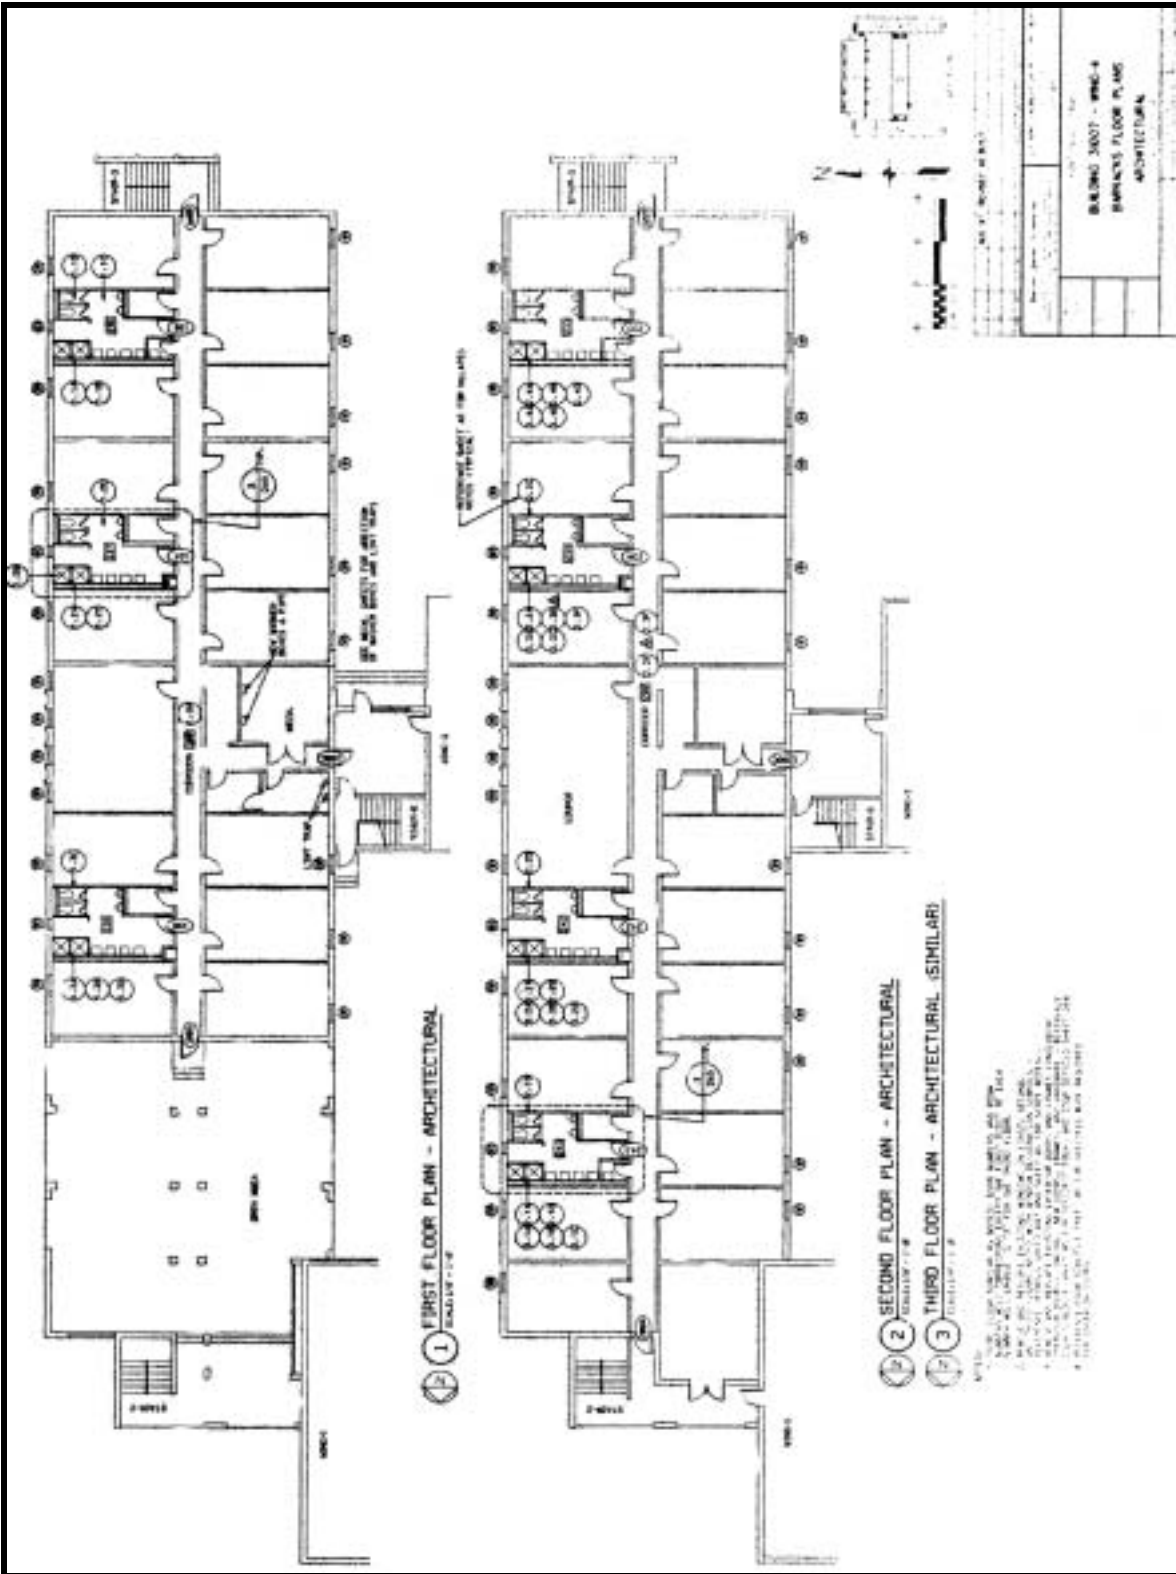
A-style barracks, Bldg. 31007 floor plans, wing 4 (ca. 1971, revised 1997) (Engineering, Ft. Hood).
